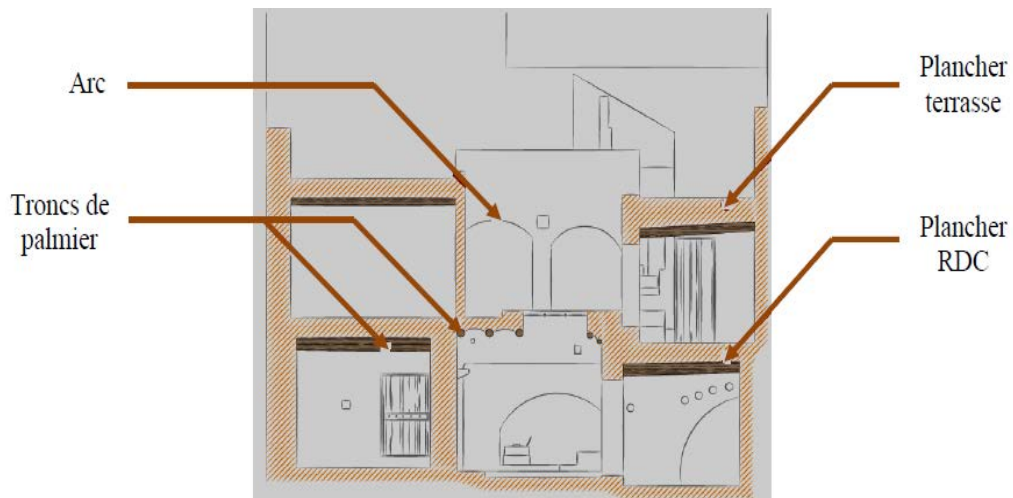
Cross-section of a traditional Mozabite house showing the various floors [70]
